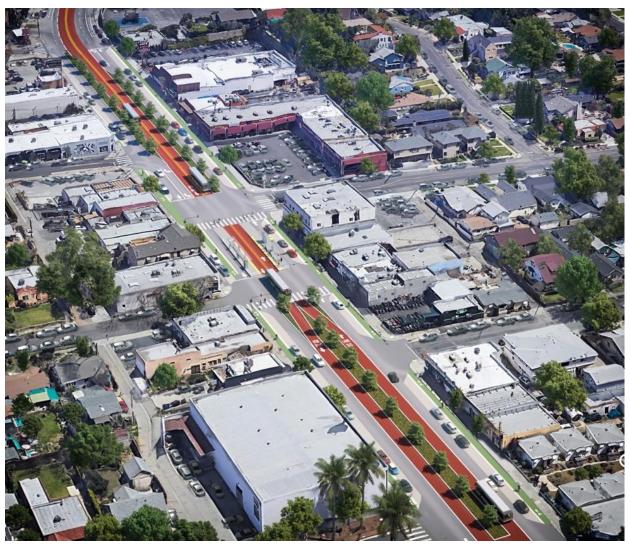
Center-running BRT on Colorado Boulevard in Eagle Rock (east of Eagle Rock Boulevard) – design option with single travel lane (Staff recommendation)
